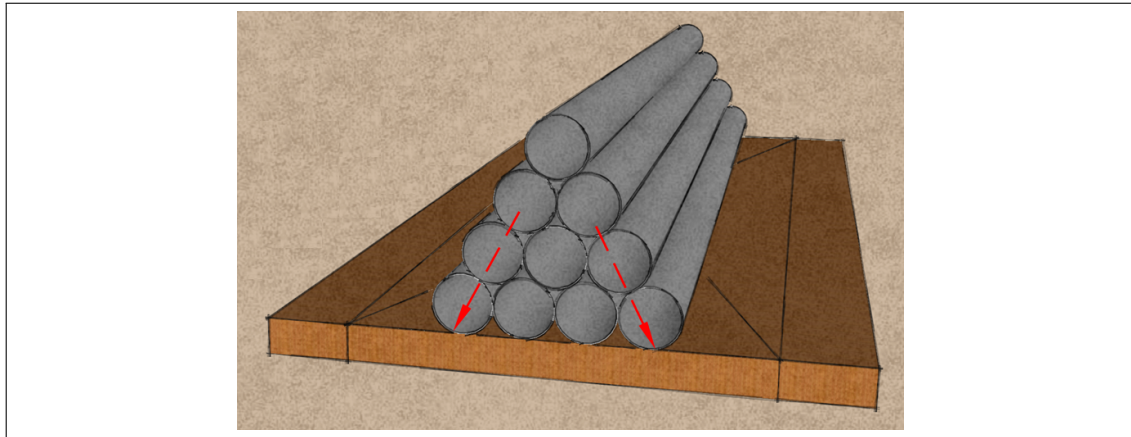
Impression of king piles stored at site, used SketchUp
